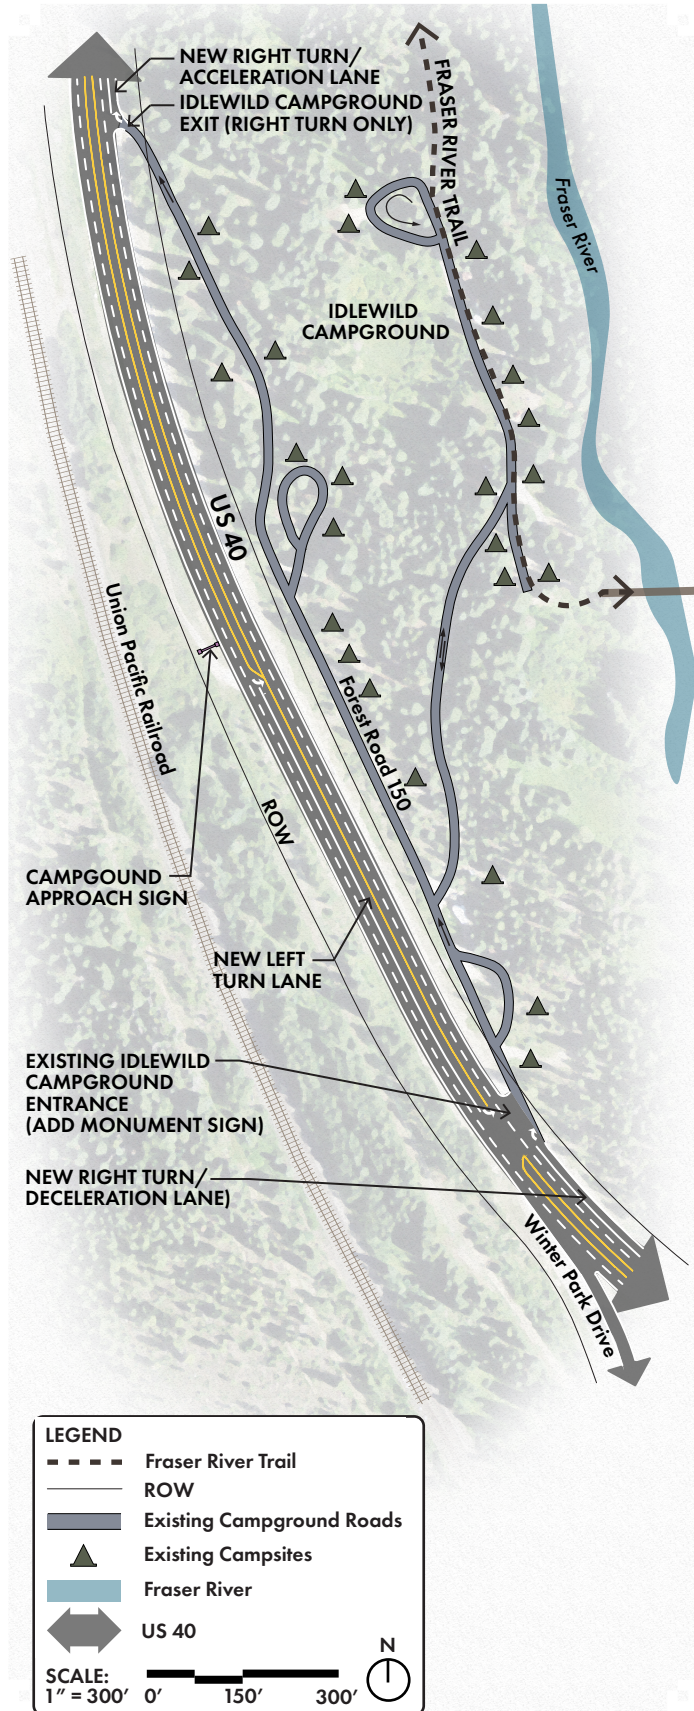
Concept plan for improved access to Idlewild Campground along US 40.
